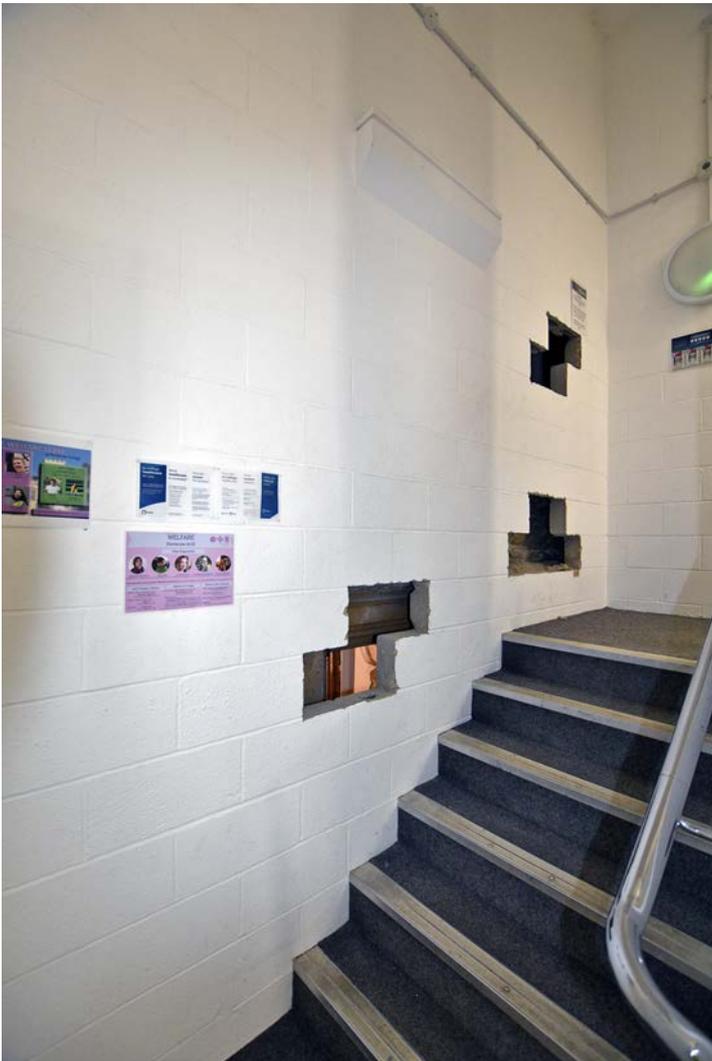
Stairs at landing above ground floor with 3 trial holes in wall [B, C, D]
